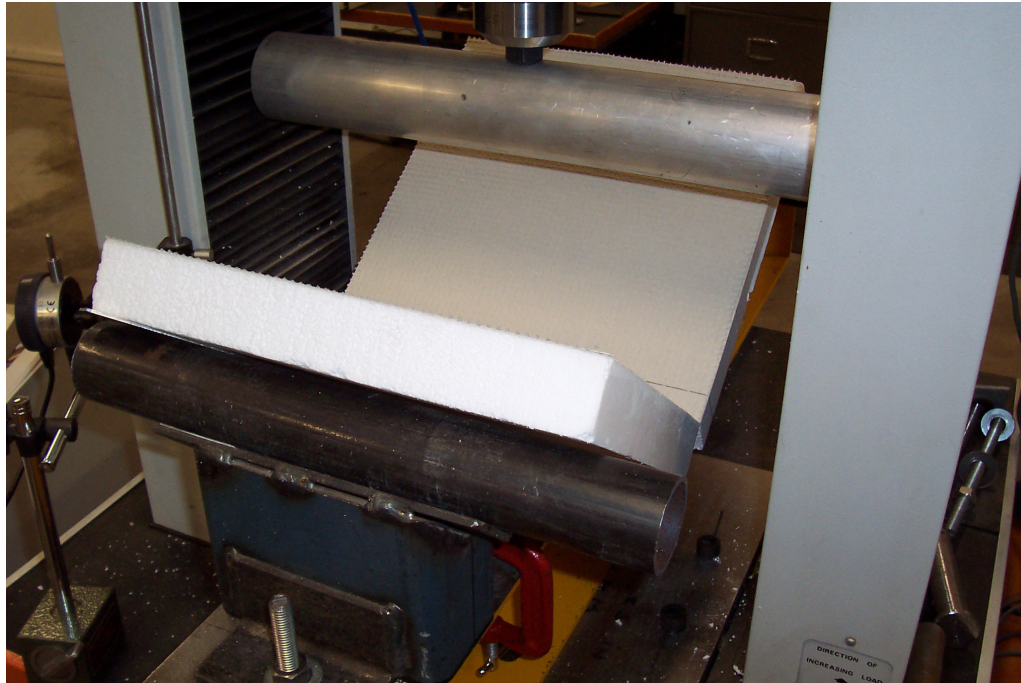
Typical bending test specimen after testing – fibre mesh in compression
